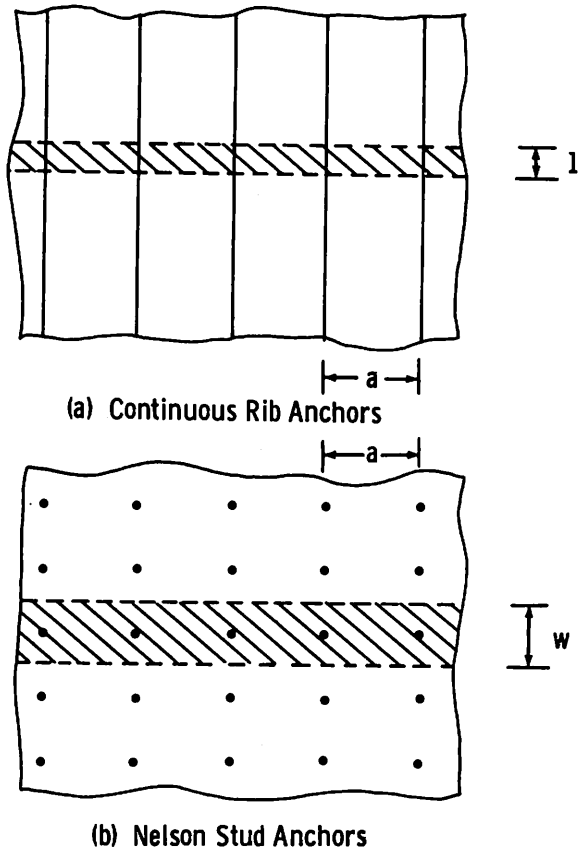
Anchor Layout with Strip Used for Analysis.
